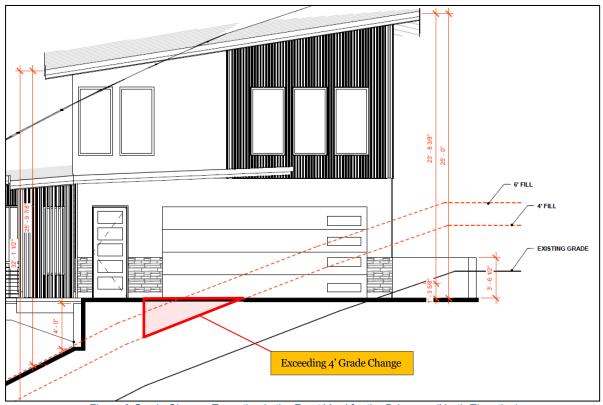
Grade Change Exception in the Front Yard for the Driveway (North Elevation)
